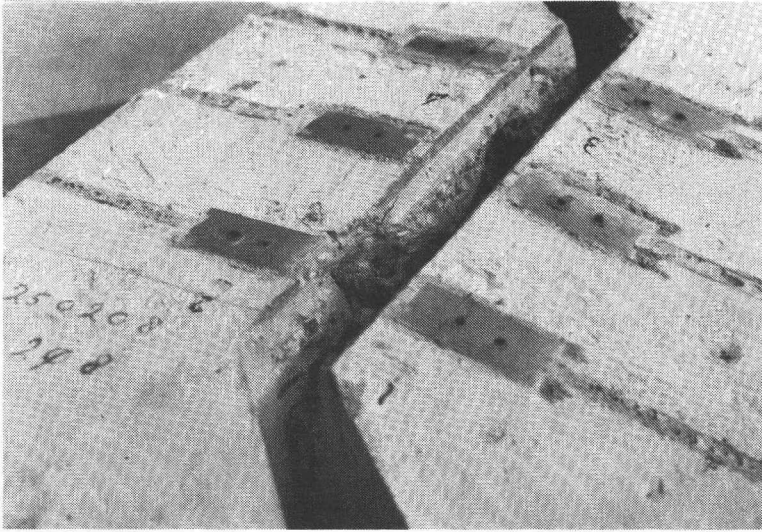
Crack face of a specimen, reinforced with 2 stirrups  $\phi$  8 mm, showing crater-shaped holes around the reinforcing bars (after removal of loose material)
